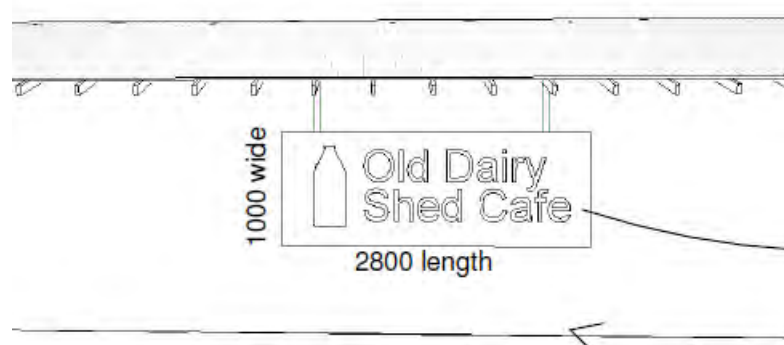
Proposed steel wall sign – Dairy Shed northern elevation
